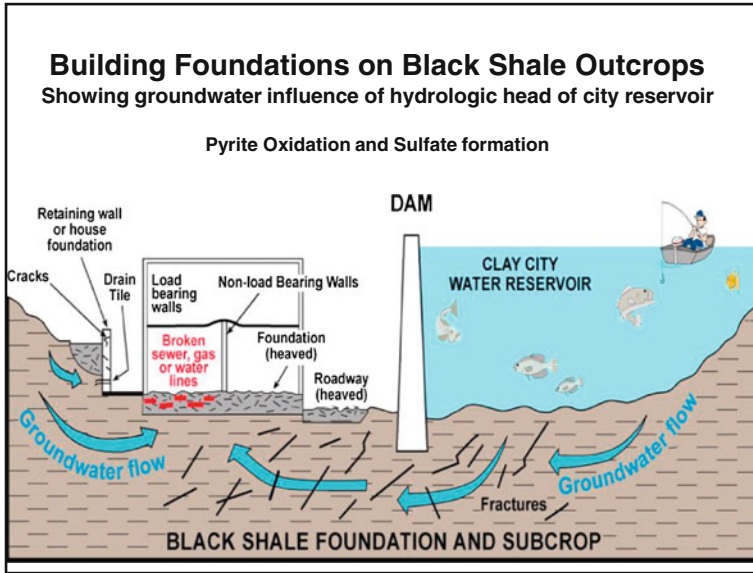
Schematic diagram of building foundation in Chattanooga Shale showing water reservoir and groundwater infiltration
